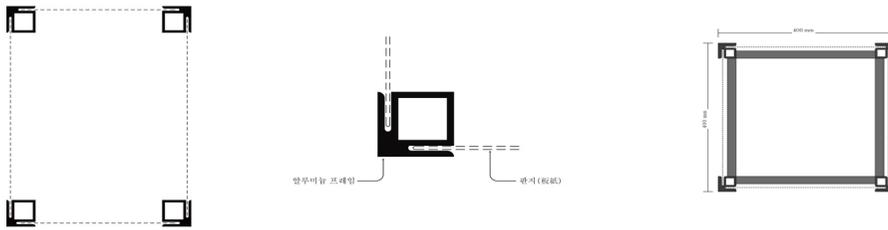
Frame Structural Drawings - CAD1(Card Board D; 5.25 mm).
